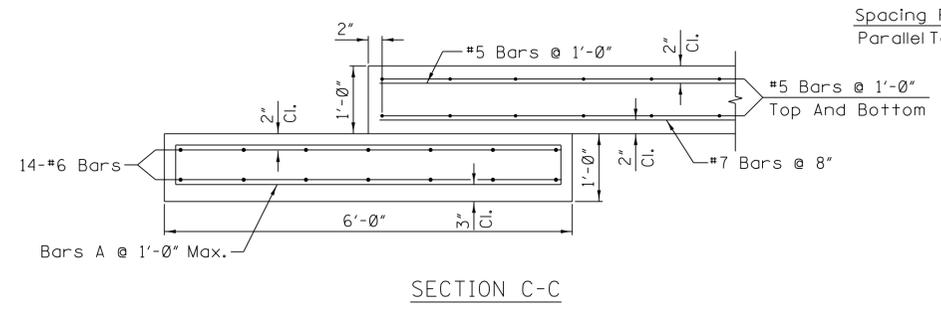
DETAIL SHOWING METHOD OF SEATING BRIDGE END PAVEMENT ON BRIDGES WITH NO PAVING BRACKET
